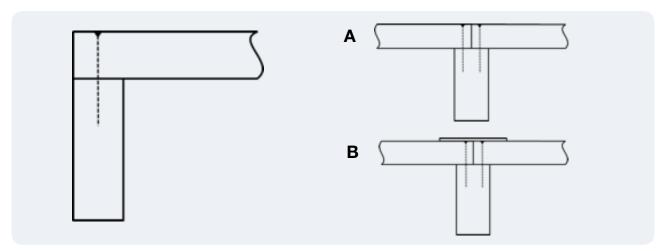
Floor-to-wall support connection with a single partially threaded self-tapping screw.
